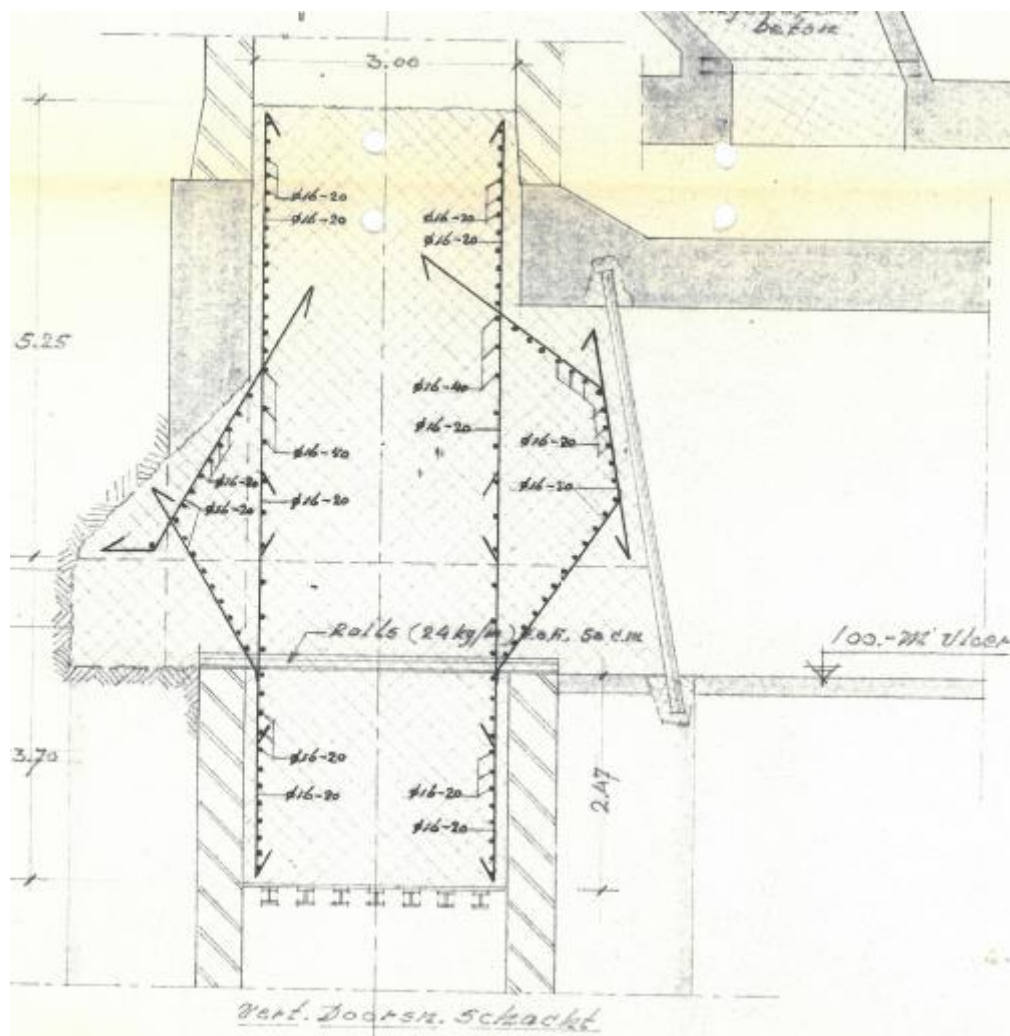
Sectional drawing shaft barrier shaft Melanie /51/
